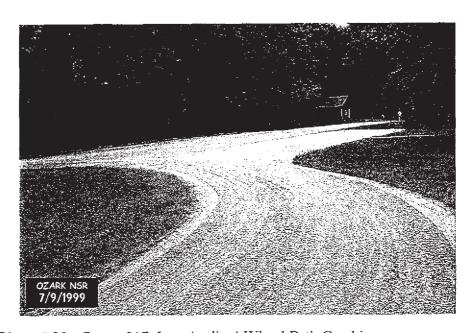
Route 217, Longitudinal Wheel Path Cracking.
